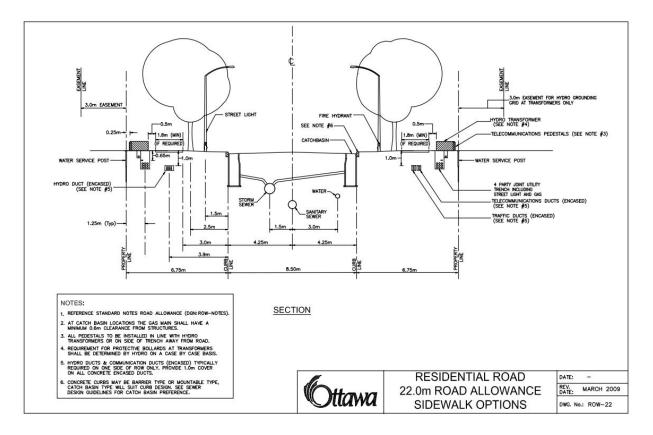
Proposed Meynell Road Cross-Section - without Parking
